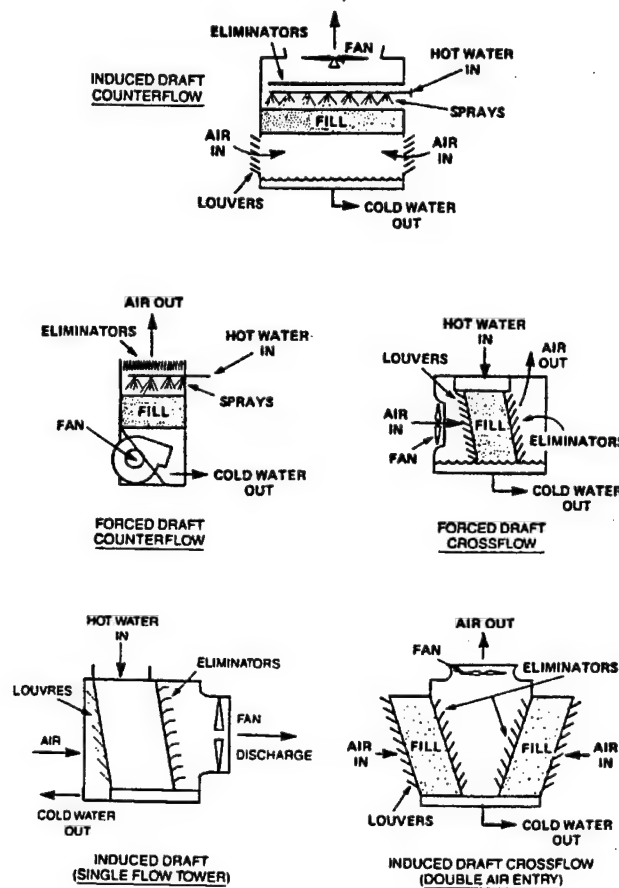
Conventional Mechanical Draft Cooling Towers.
